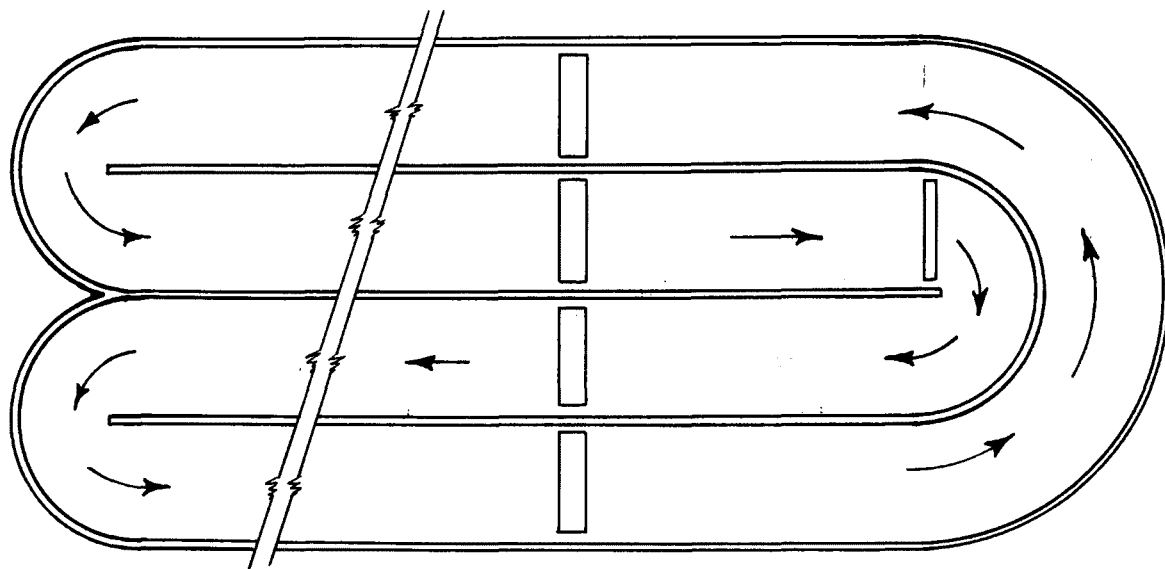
Cold confinement building with shallow pit for oxidation ditch
